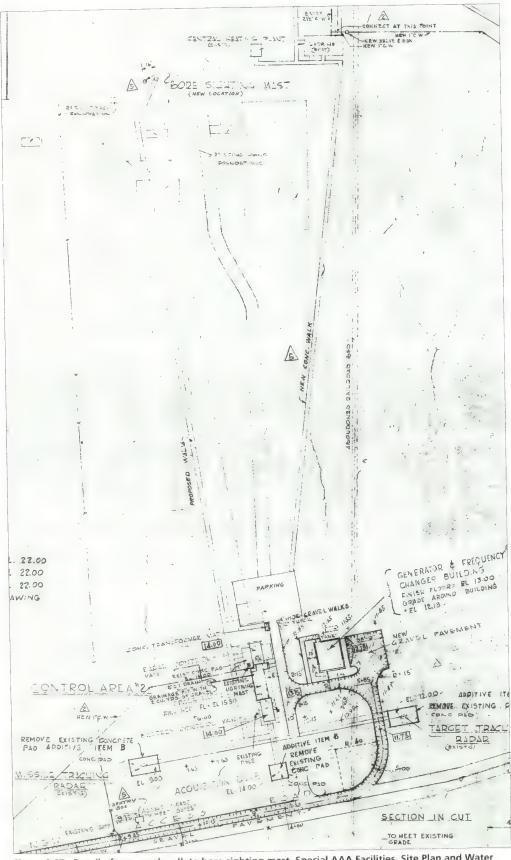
Detail of proposed walk to bore sighting mast, Special AAA Facilities, Site Plan and Water Line, 1955. Although this drawing was updated to record "as built" conditions in 1960, the concrete walks to the bore sighting masts are still labeled "proposed walk" and lack an indication that they were completed (GATE 11053).
